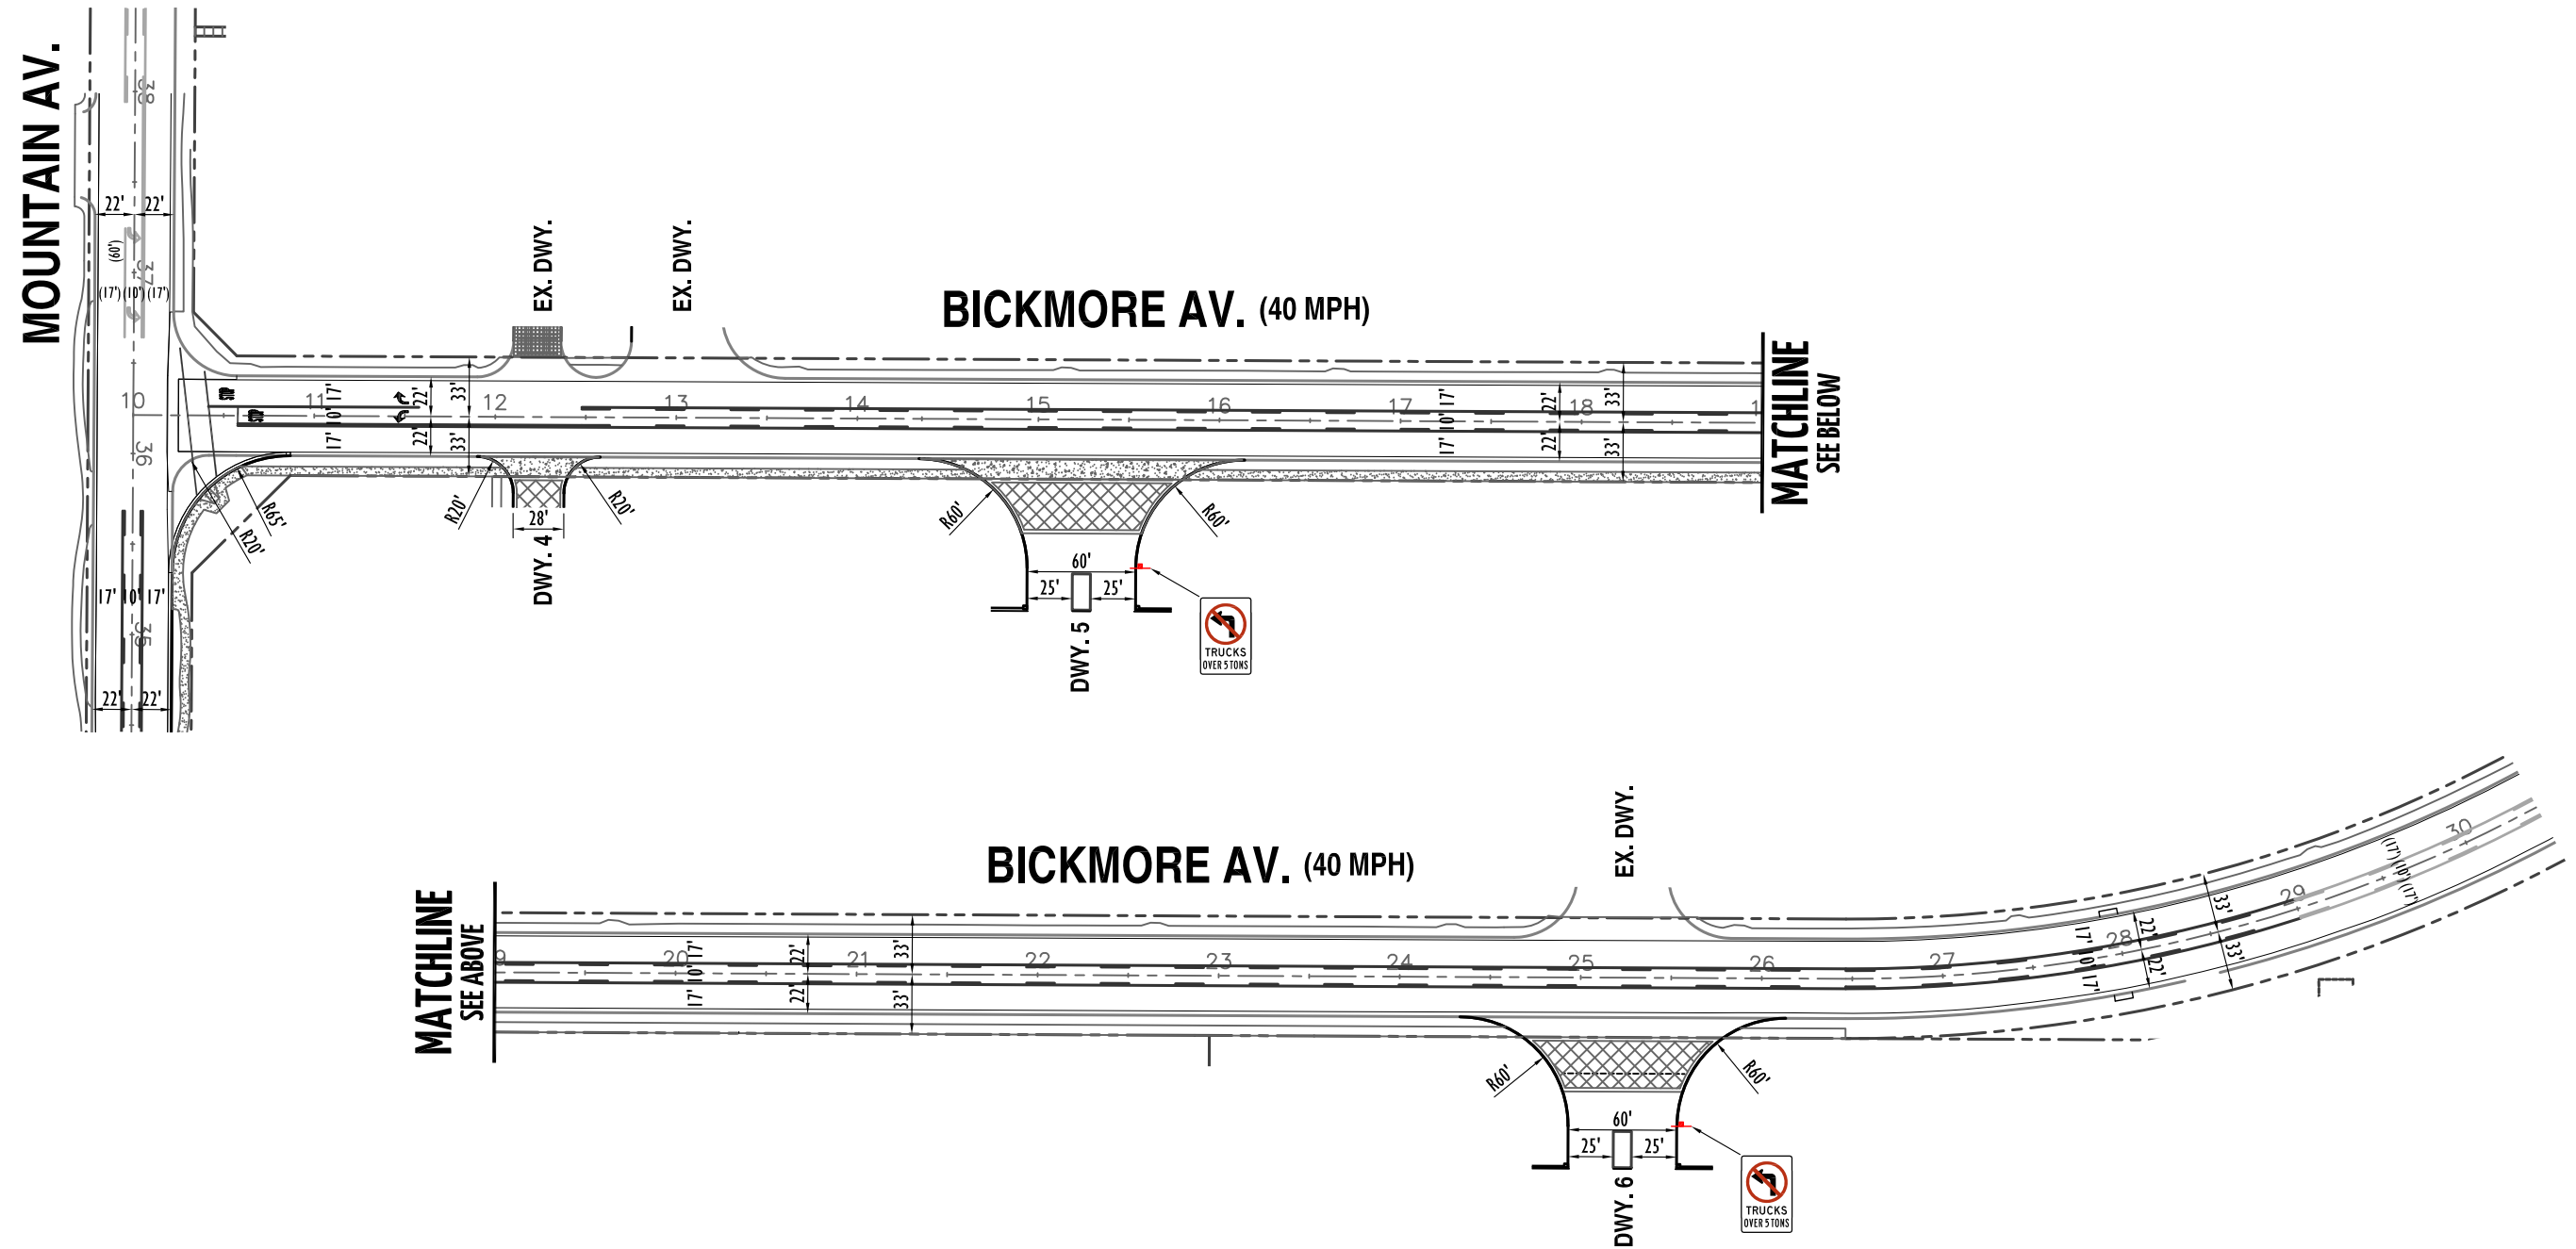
(2 OF 2): CONCEPT STRIPING PLAN
